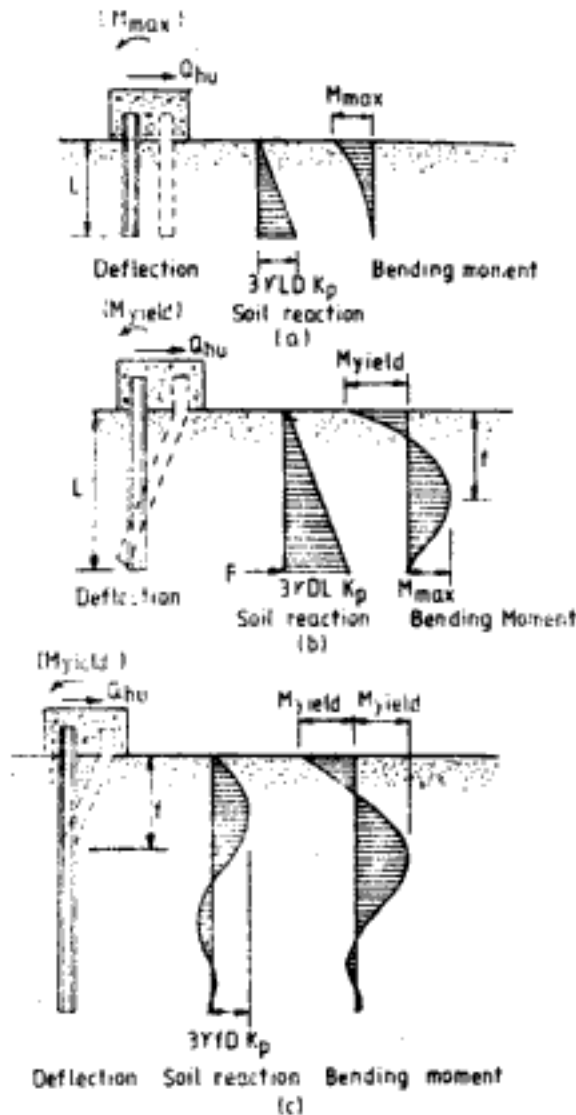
Failure mechanisms of fixed head piles in sand: (a) short piles, (b) intermediate piles, (c) long piles (After Broms, 1964b; with permission of the American Society of Civil Engineers, New York)
